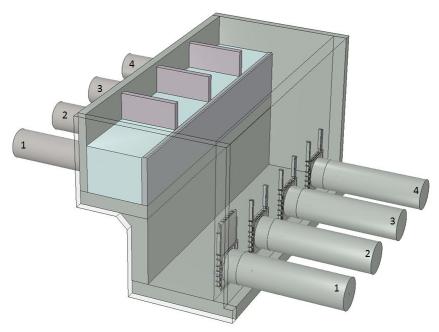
Outfall Structure and Sluice Gates (Hoists of the Sluice Gates are not Shown)
